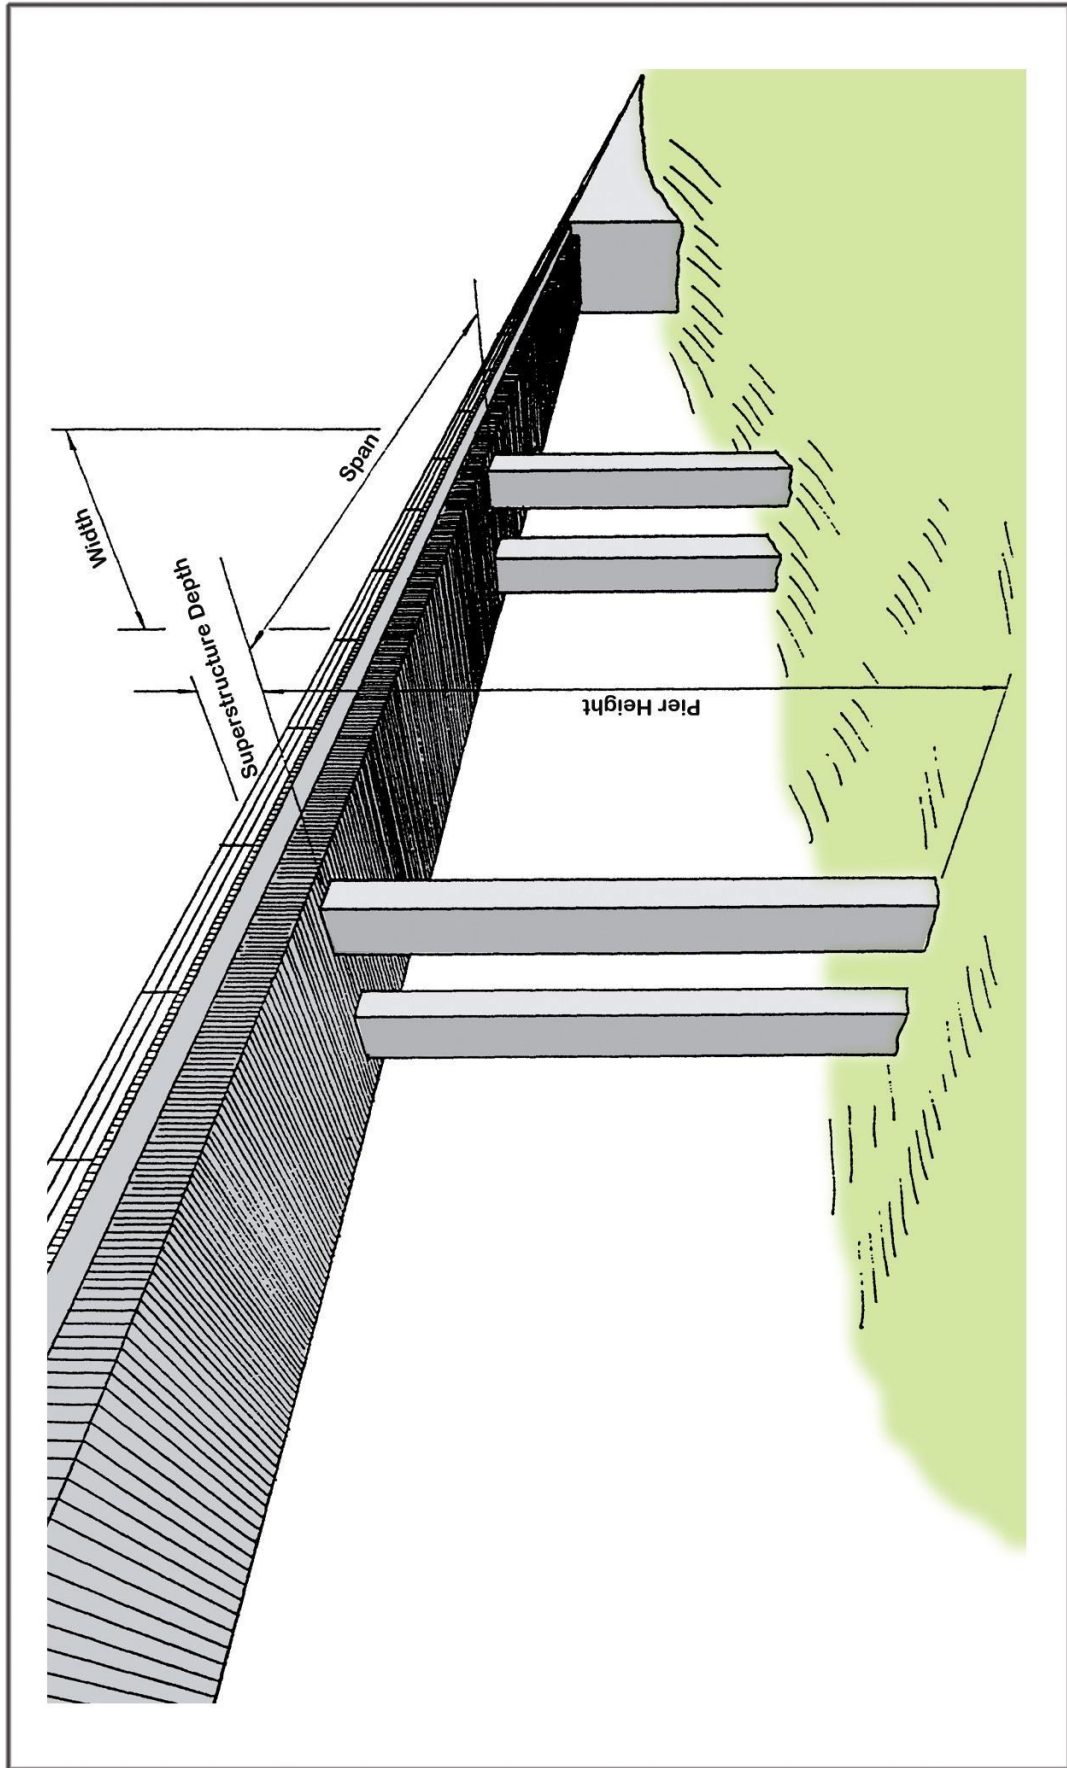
Failure of Two-Dimensional Drawing to Indicate Bulkiness
